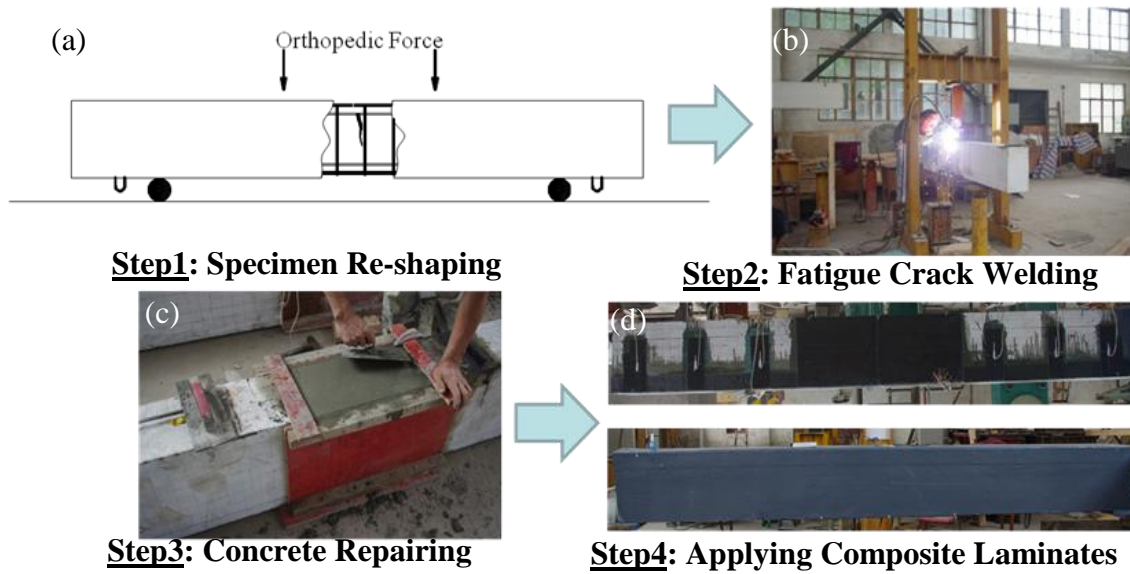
The repairing/ retrofitting steps for the fatigue damaged SRC girders: (a) applying an orthopedic force to compensate the residual plastic deformation; (b) fatigue crack welding ; (c) replacement of damaged concrete; (d) applying the composite wraps
